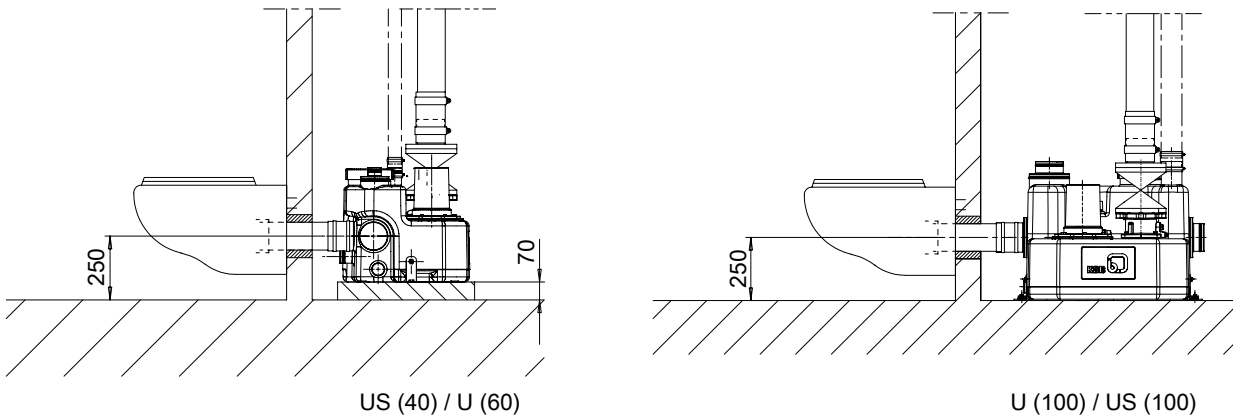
Installation information for direct connection of a MiniCompacta US40 / U60 / U100 / US100 to a wall-mounted toilet bowl
